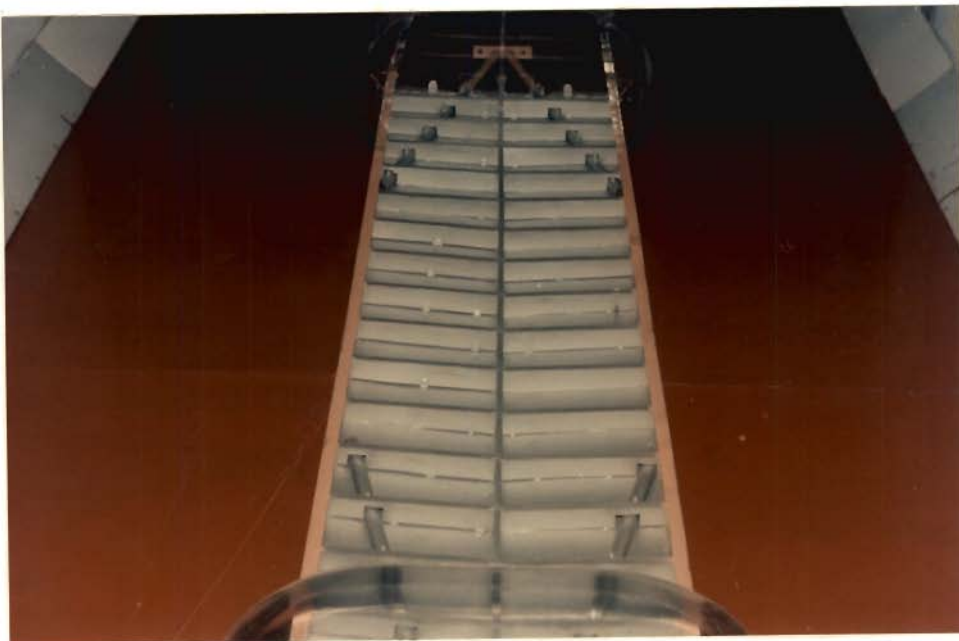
(c) Photograph showing bottom view with main and cross girders
